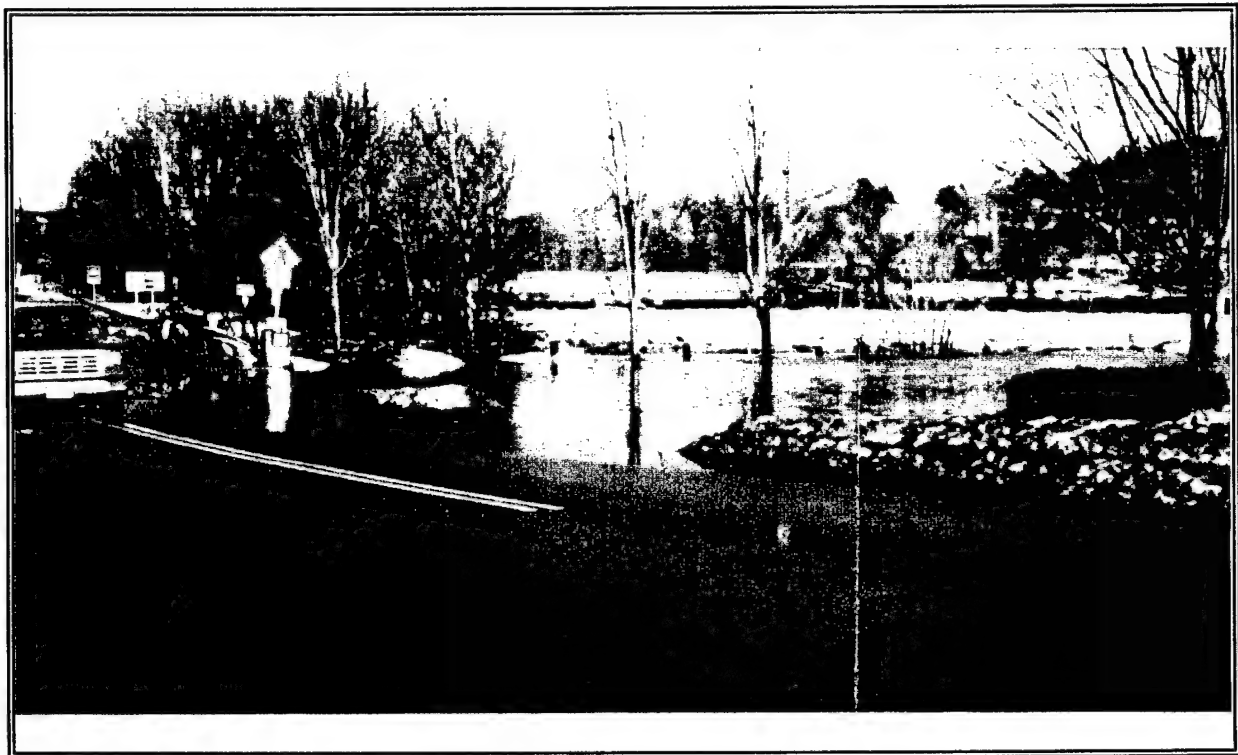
RT. 97 BRIDGE LOOKING ACROSS FROM MAIN STREET
